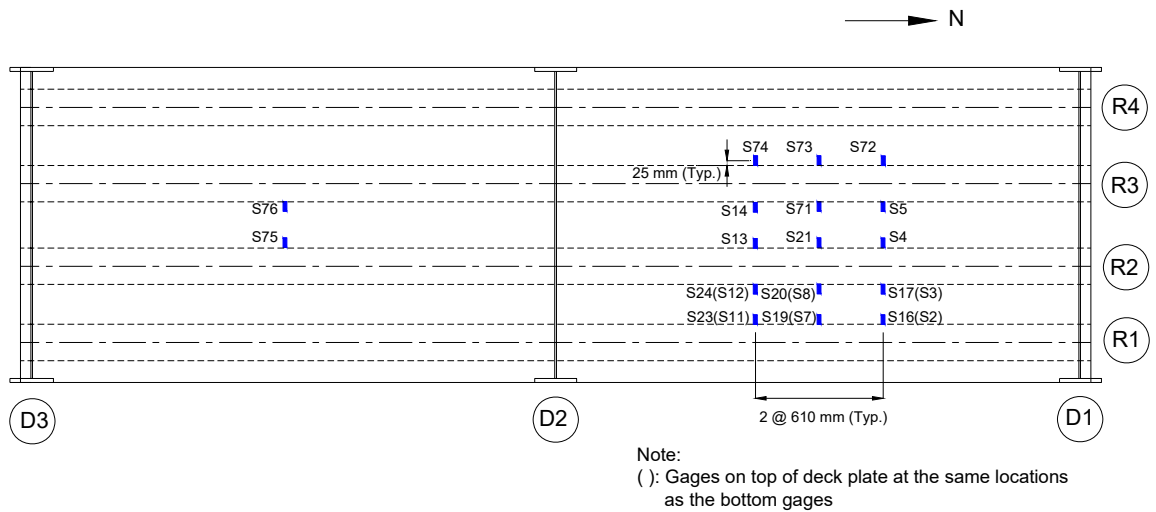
Specimen 2: Uni-axial Strain Gages in Deck Plate near Rib-to-Deck Welds
